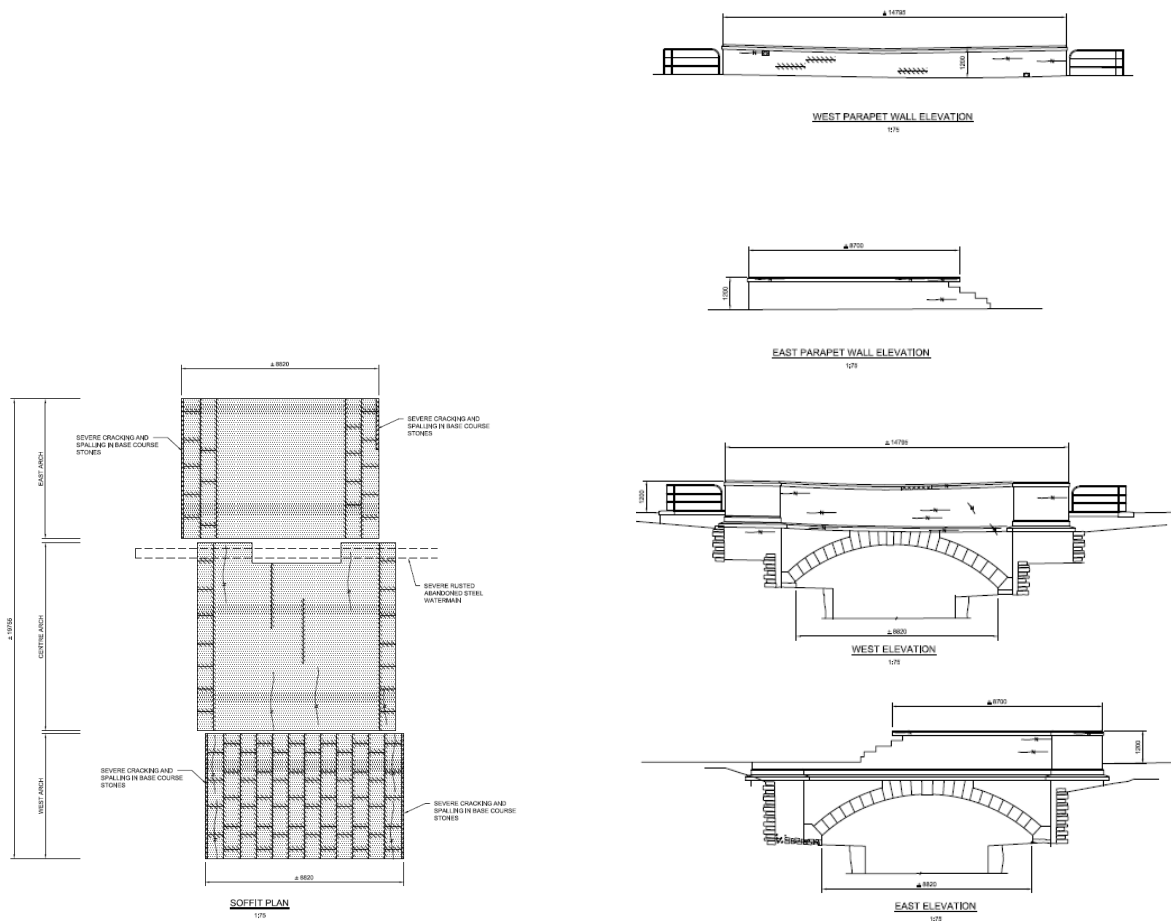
Plan view (left) and elevation views (right) of the existing conditions of the Old Booth Street Bridge showing cracks, moss of mortar, erosion, etc. Source: City of Ottawa/WSP, Booth Street Bridge over Open Aqueduct (SN017030: Condition Assessment and Renewal Options Analysis Report, February 2019 (Final), Dwg. No. 03.)
